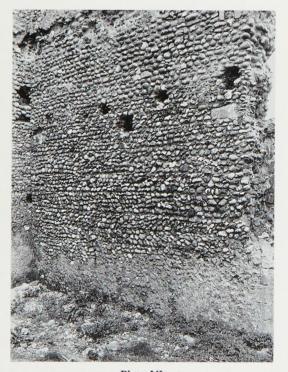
Plate VI Interior elevation of south wall of porticus showing second and third phases of masonry.
